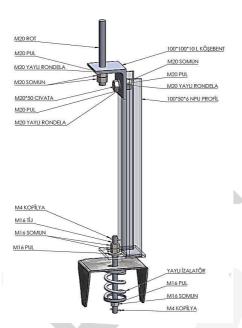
Detail of Tunnel Fan Suspension Apparatus
